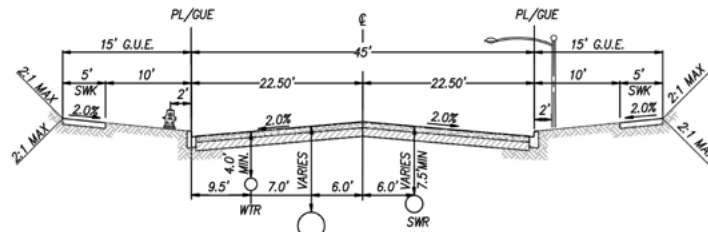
ROADWAY CROSS SECTIONS
